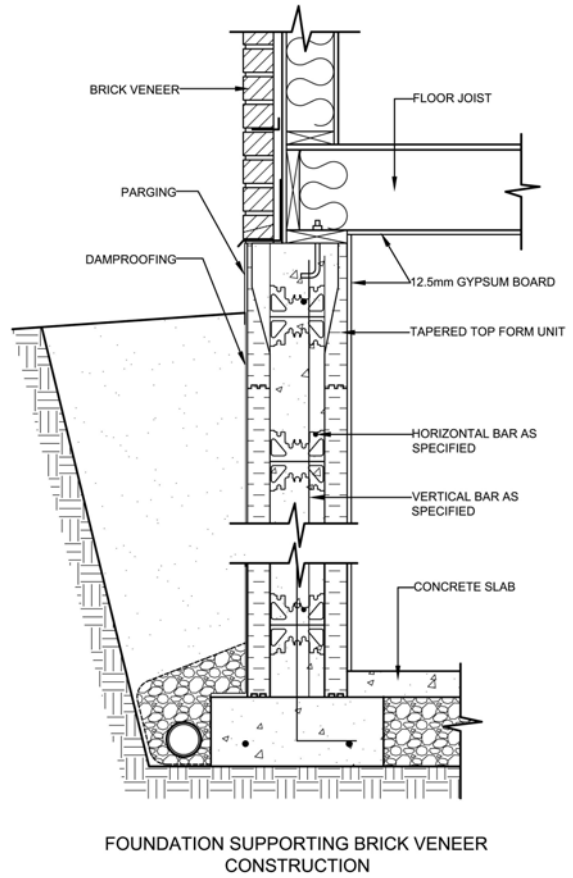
Section of “Arxx High Performance Wallsystems” supporting brick veneer construction
